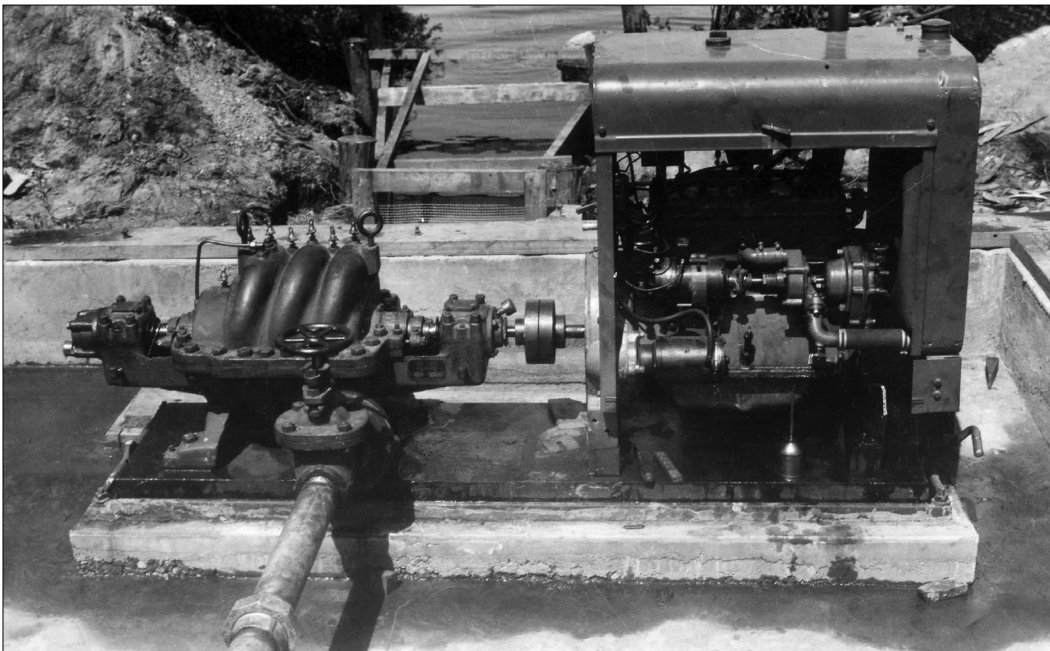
Pumping unit installed in 1931 with intake canal from lake, prior to the walls and roof being constructed on pumphouse #1. USDA Forest Service photo archives.
